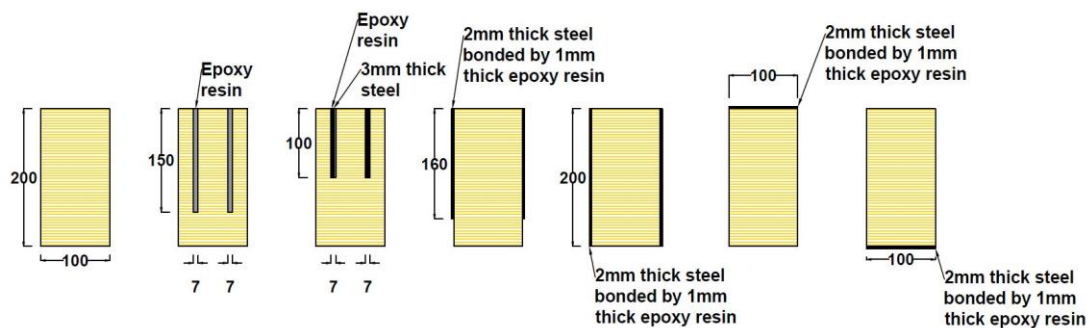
Locations of the steel reinforcement on the beams tested by Jasieńko and Nowak (2014).
